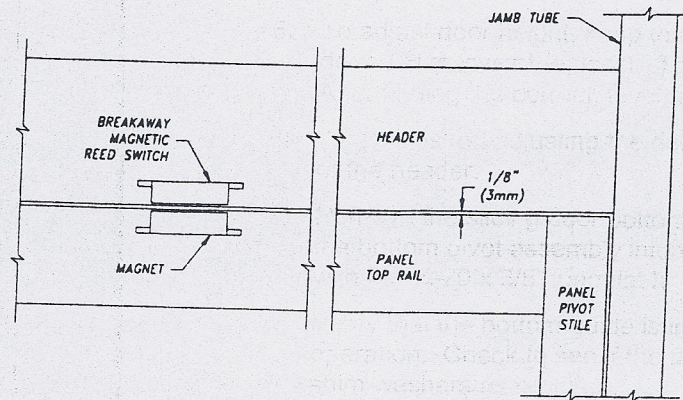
Panel (SO) Clearance for Reed Switch and Magnet
